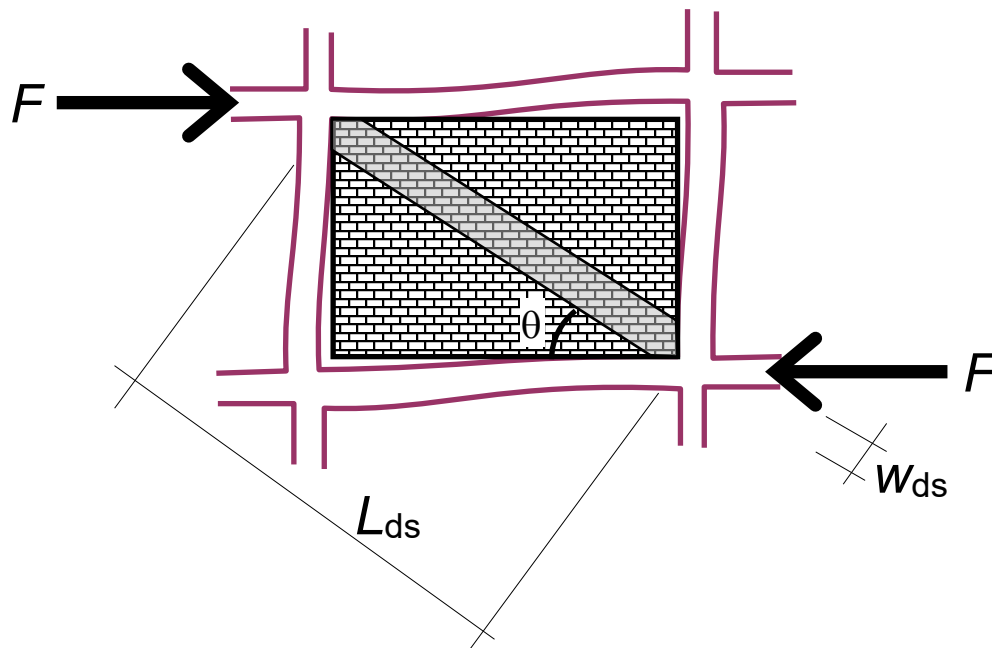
EQUIVALENT DIAGONAL STRUT OF THE URM INFILL WALL
